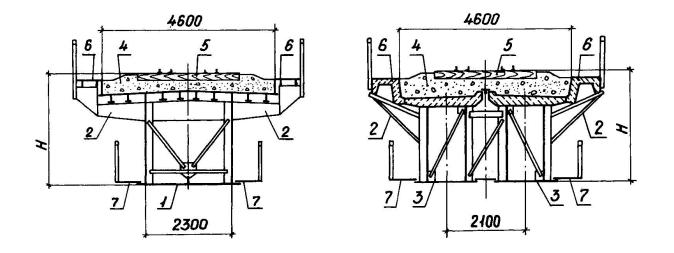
Cross section of railway superstructures: a - of the metal box one having the ballast tank of double-layer corrosion-resistant steel; b - of the two-block steel reinforced concrete; 1 - box girder; 2 - cantilever part; 3 - steel reinforced concrete block; 4 - ballast; 5 - upper road structure; 6 - side-walks; 7 - inspection runway.
